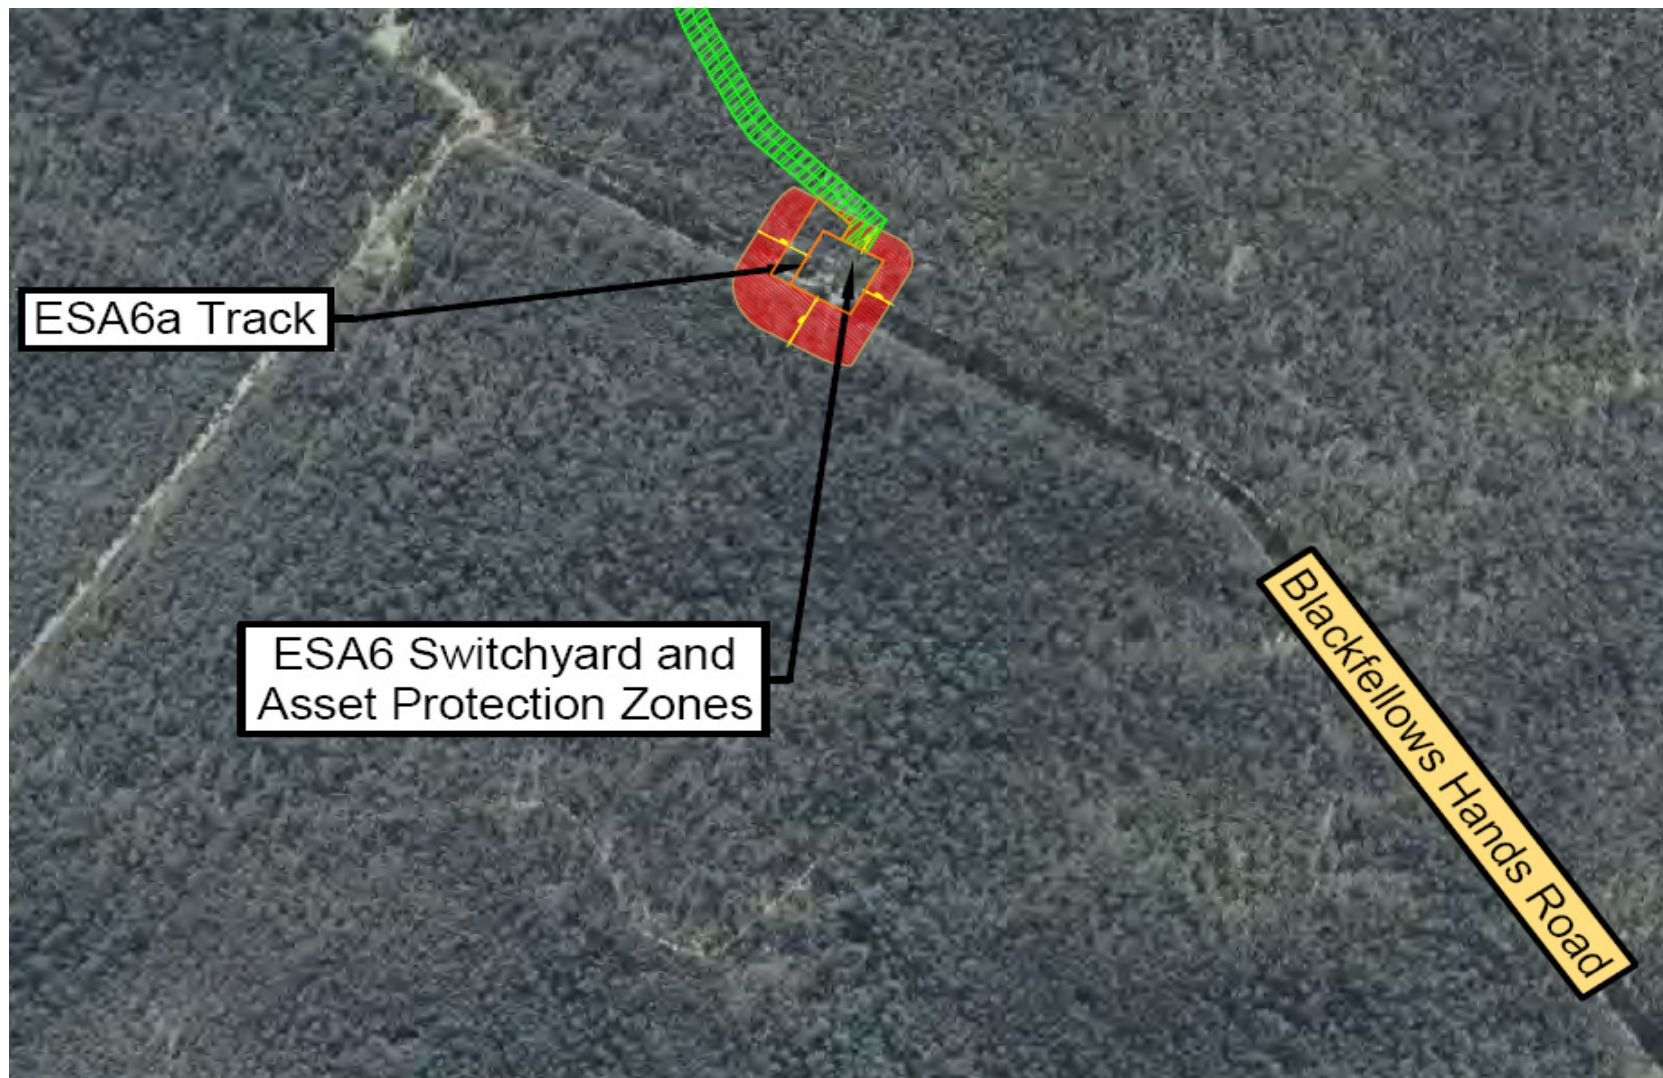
Site Plan of Angus Place Colliery Extension – Switchyard Site.
